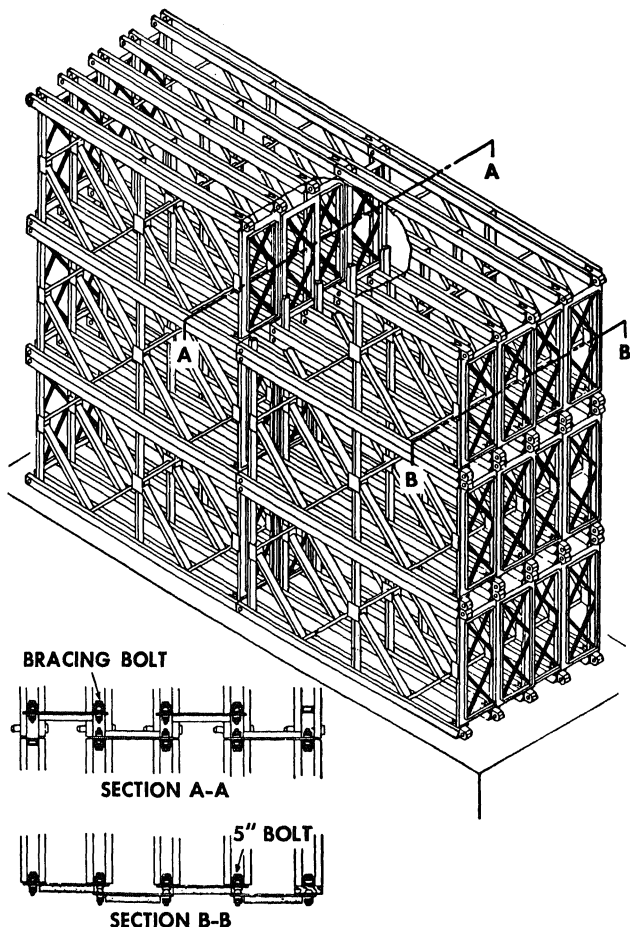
Expedient panel crib pier with panels transverse to axis of bridge
